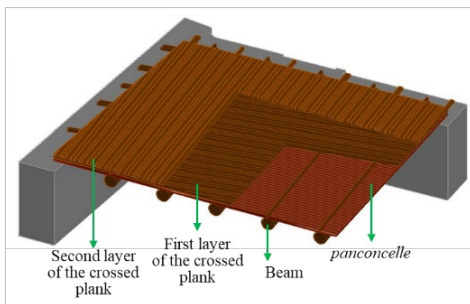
Structural reinforcement on wooden floors (Luciana Di Gennaro, 2016).
